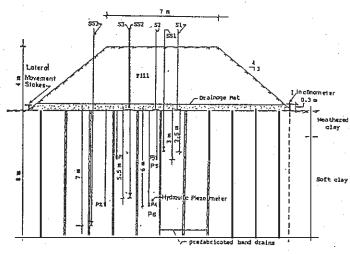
Cross-section of test embankment with drains and location of field instruments.
